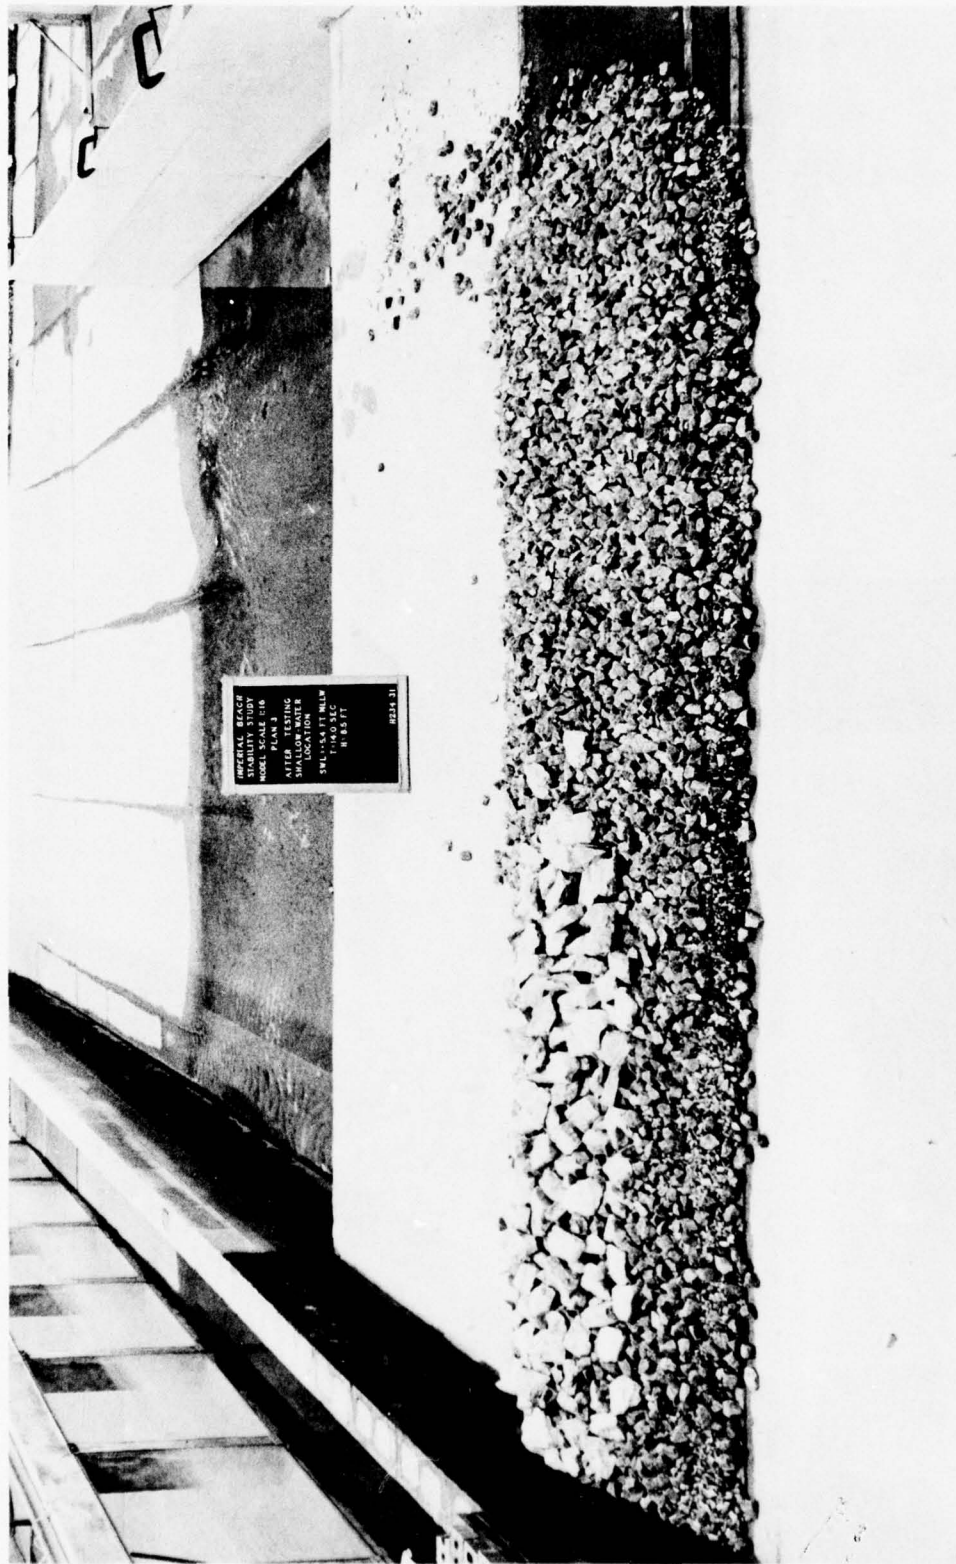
Sea-side view of Plan 3 in the shallow-water location after 2.0 hr of 14.0-sec, 8.5-ft waves at an swl of +5.4 ft mllw
